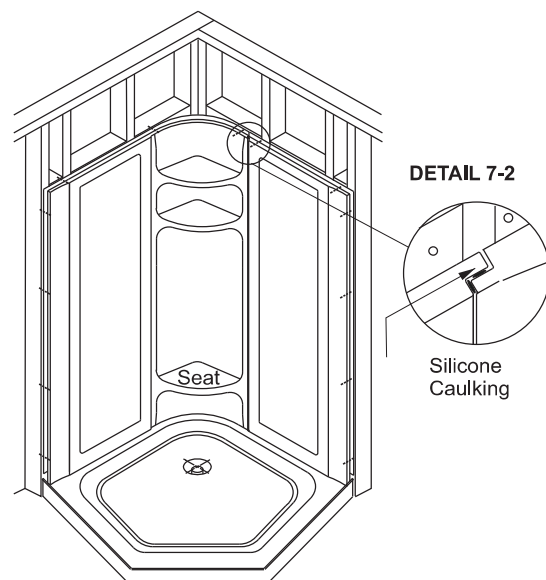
NEO ANGLE SHOWER ASSEMBLY
